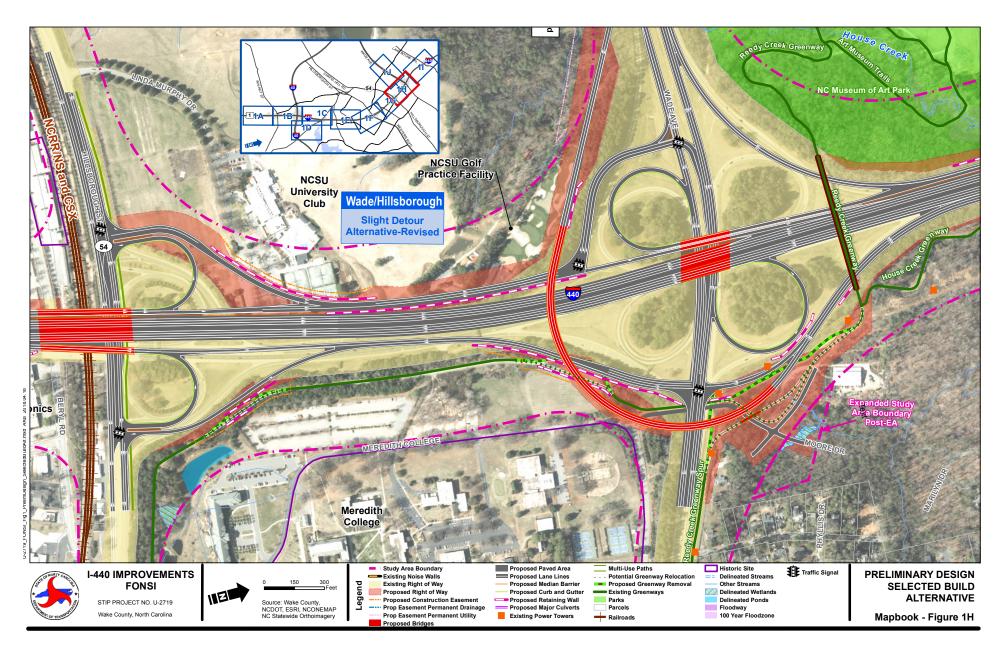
Hillsborough St & Wade Ave Interchanges - Slight Detour Alternative-Revised
